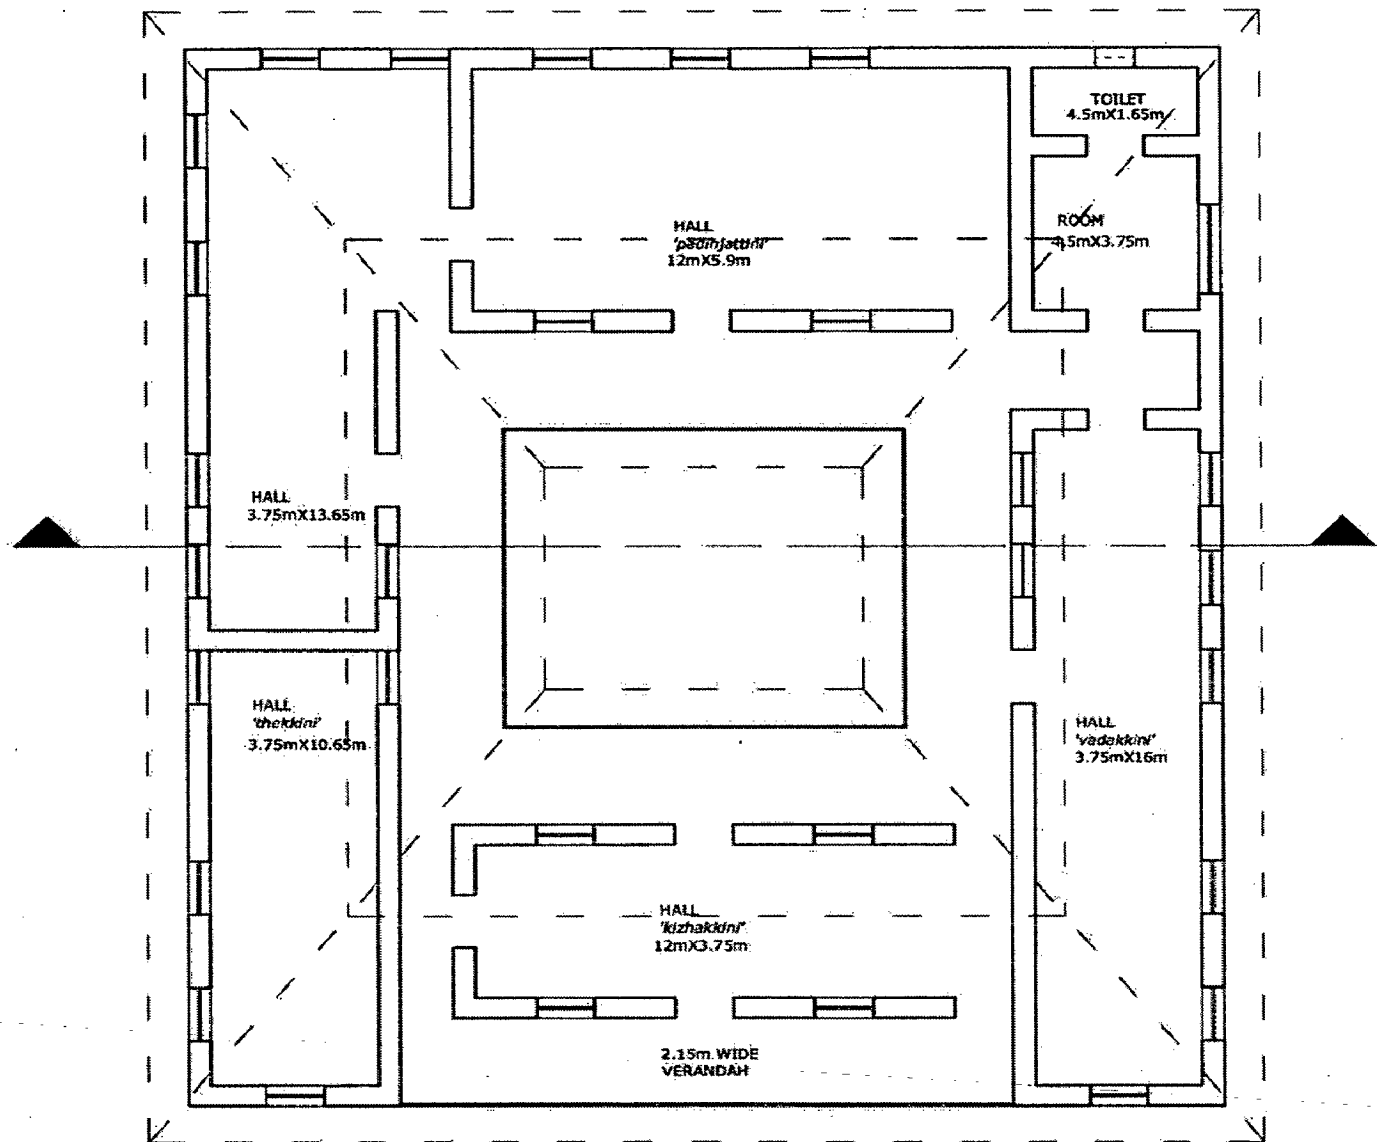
First floor plan of double storeyed courtyard house with two courtyards
